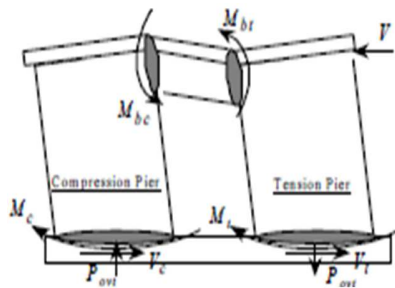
Strong Pier/Weak Spandrel Failure Mechanism Elshafie[32]
